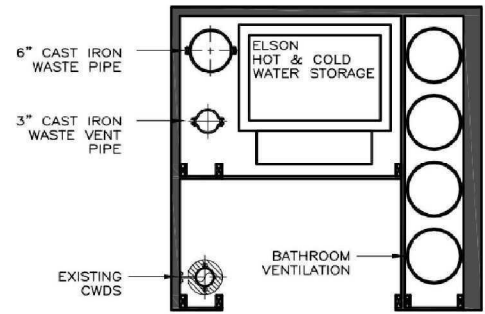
Layout of single bedroom riser after existing LTHW pipework has been removed
